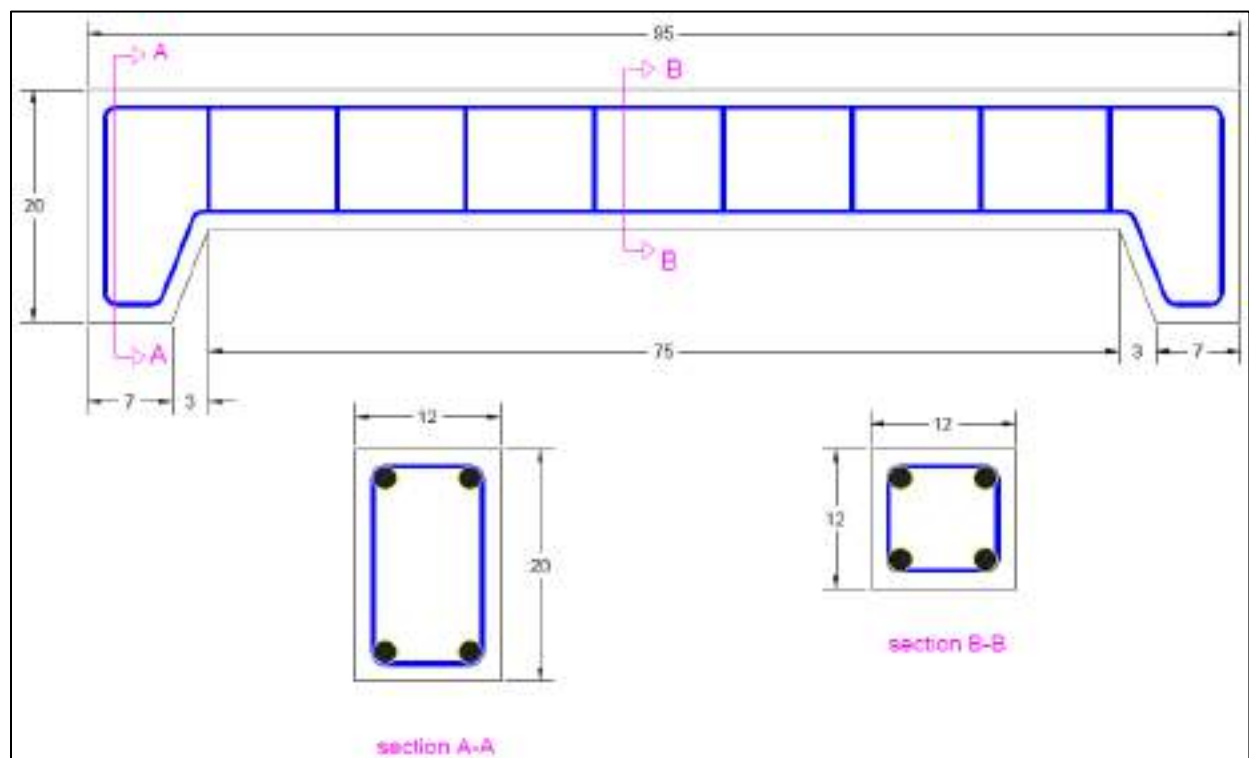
The Geometry and Reinforcement Details of The Column in (cm).
